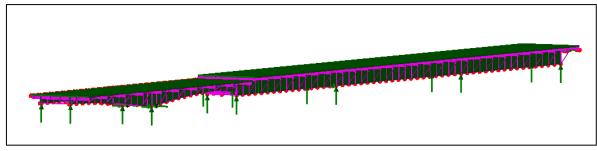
3-D View of Marystown Harbour Bridge FEA Model in LUSAS Bridge.
